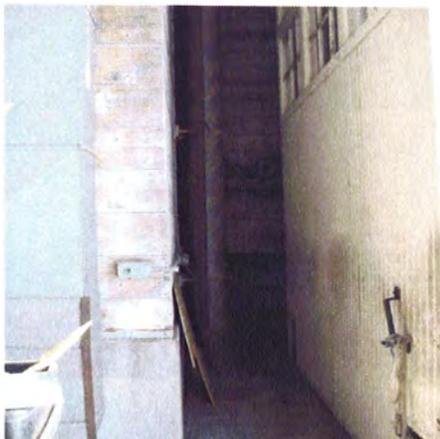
Direction: Southeast. Hangar # 5. General location where sample 0001 (tarp) was taken. Note the partial wood interior walls and distant vent pipe.
